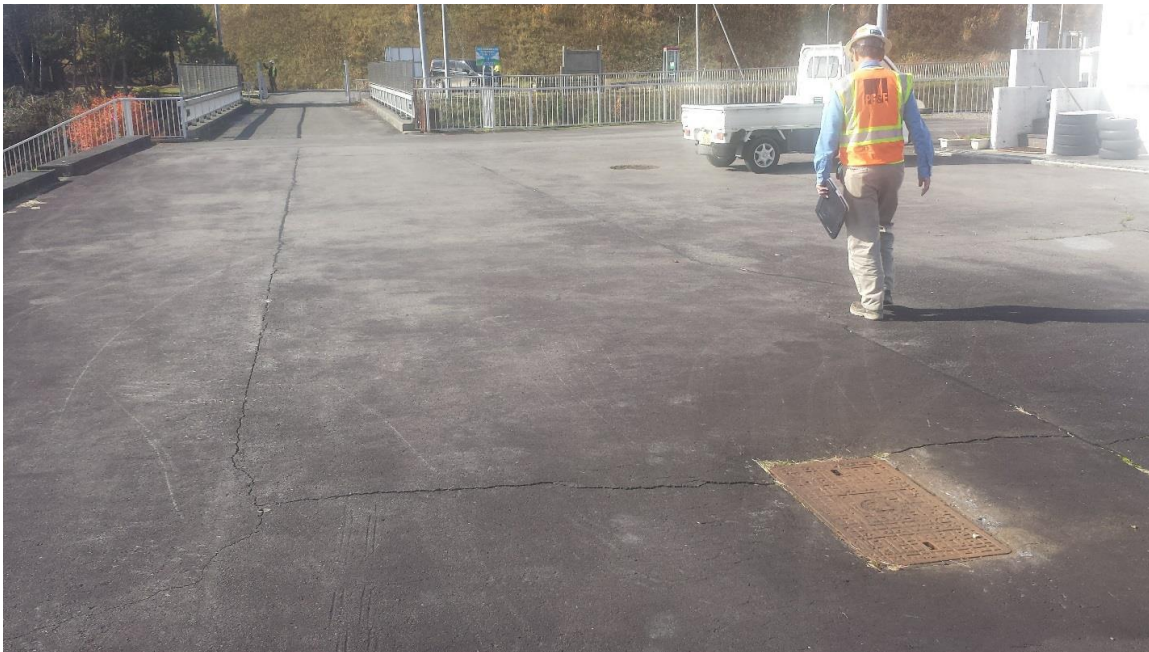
Fresh crack in crest pavement noted near contact between right abutment and spillway channel. 42.885648, 142.179387,
